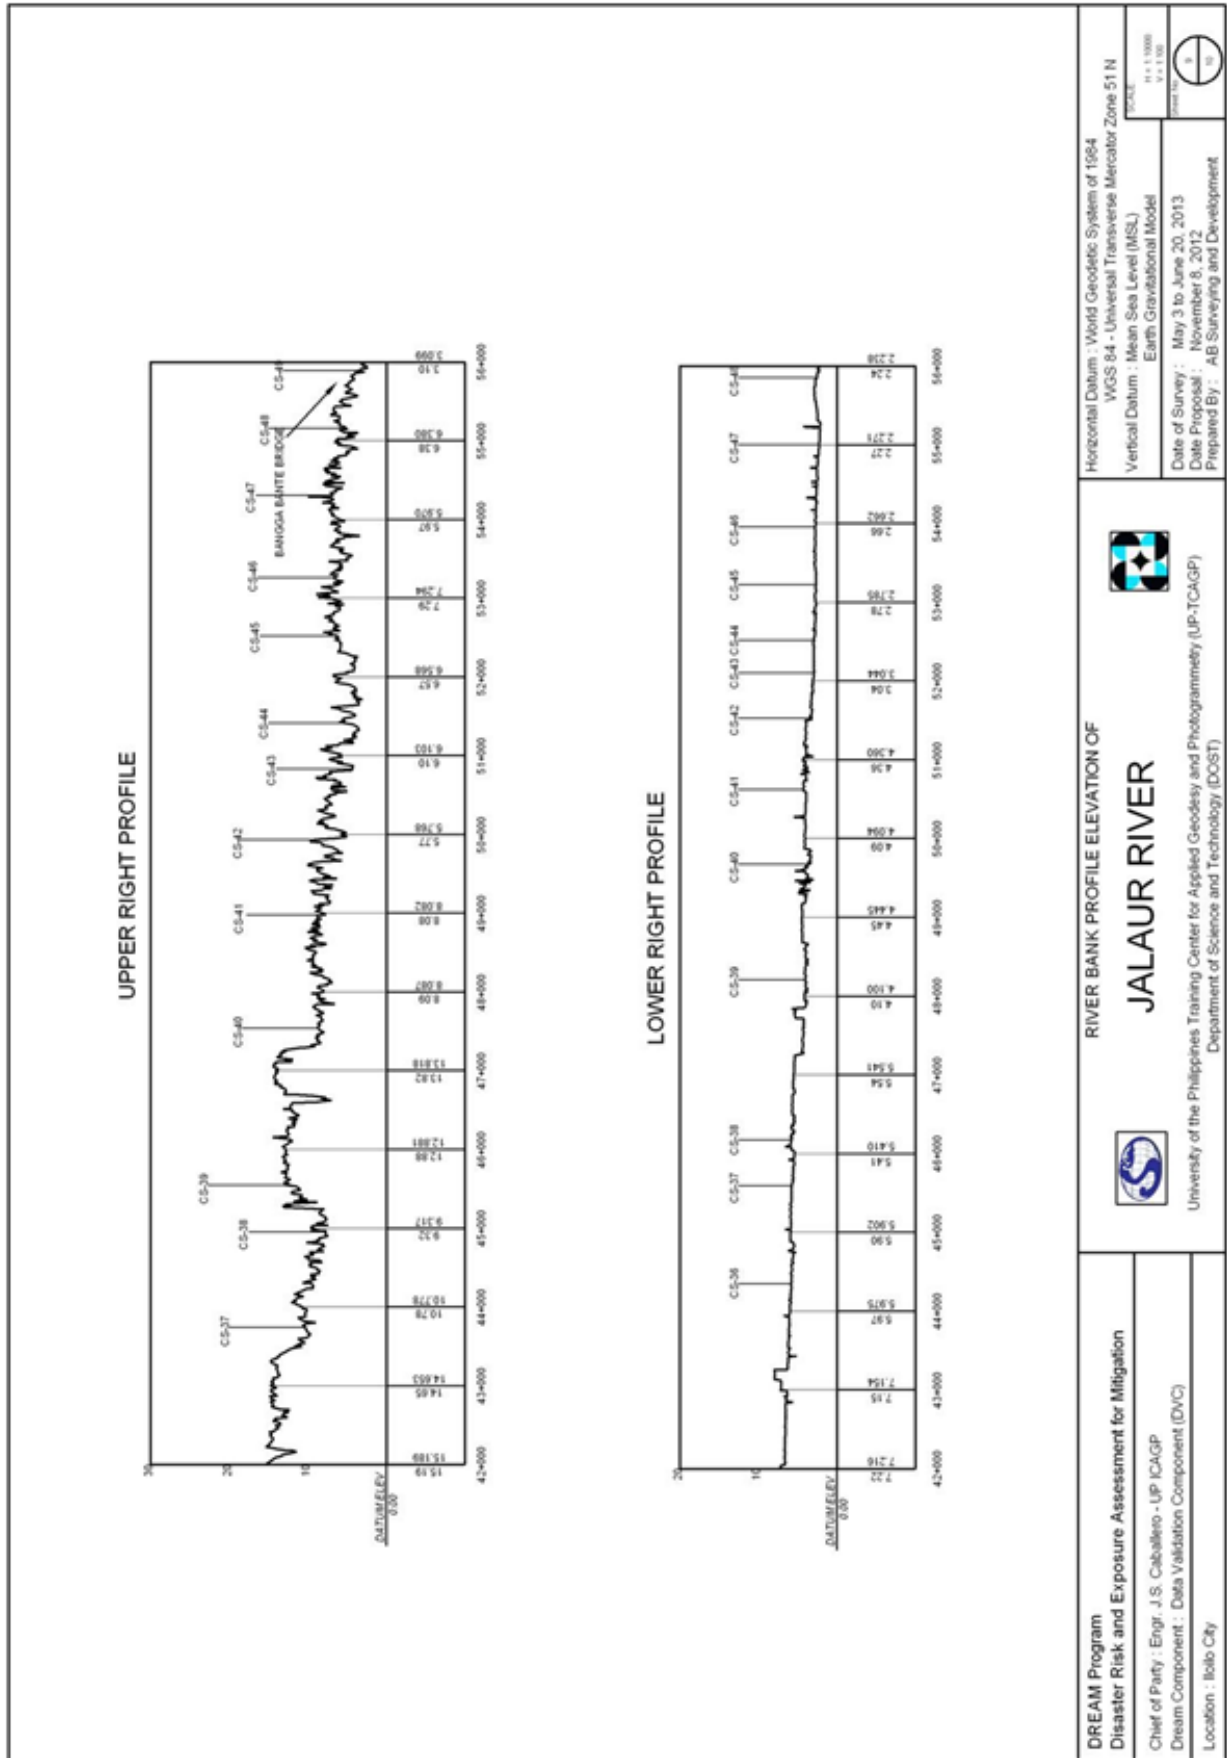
Sheet No. 9 Right River bank profile with relative location of bridge and cross-section
